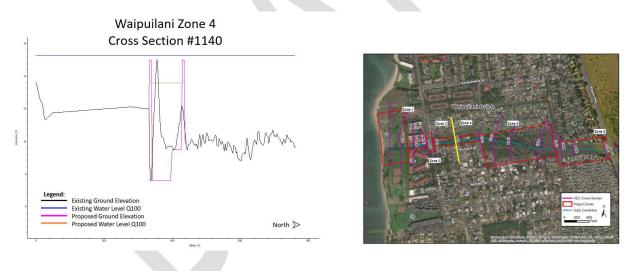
Waipuilani Channel Cross Section #1140 (left) and Key Map (right, showing cross section in yellow).
